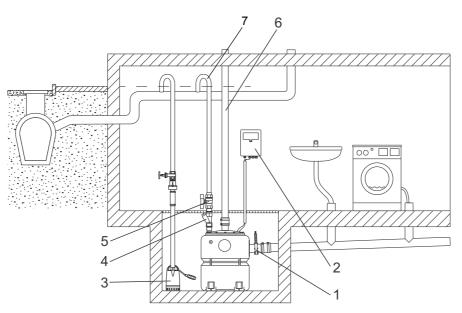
Installation example with a tank in a sump and with a controller. The diaphragm pump is not shown
